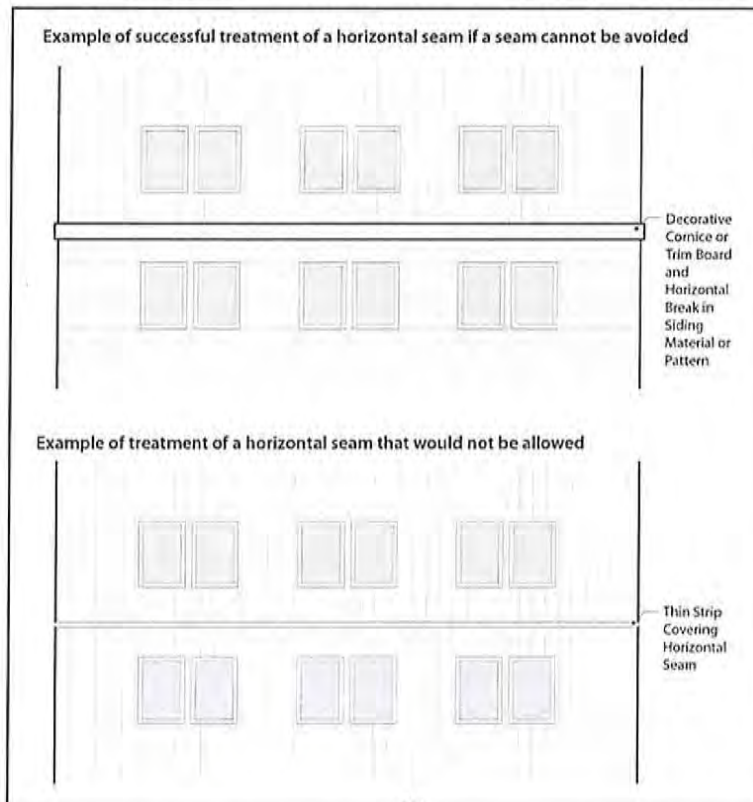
Exterior Walls – Horizontal Seam Treatment
